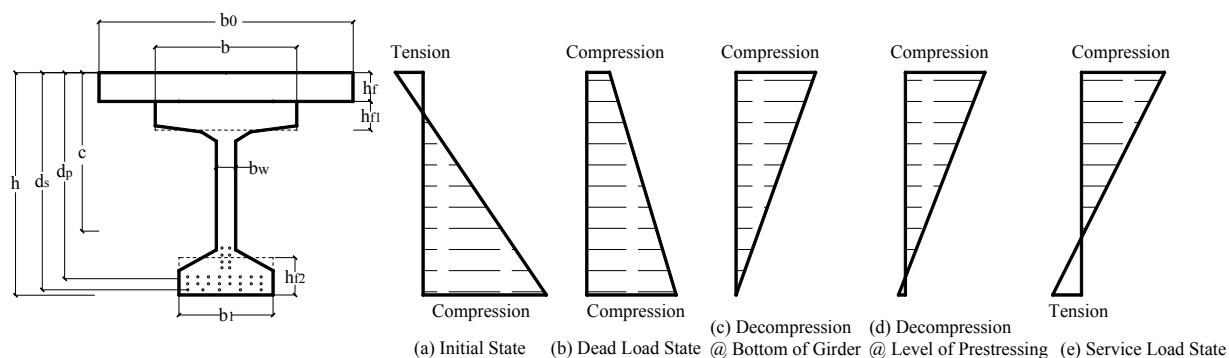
Stress distribution diagrams for a typical prestressed concrete bridge girder at various stages of loading.
